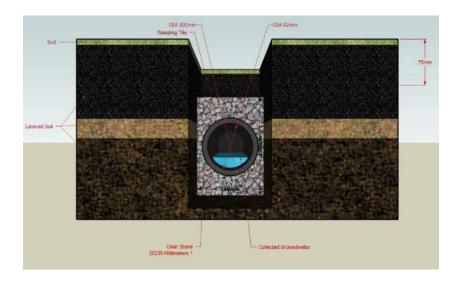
Typical sketch of a French drain (Panjami 2016)
